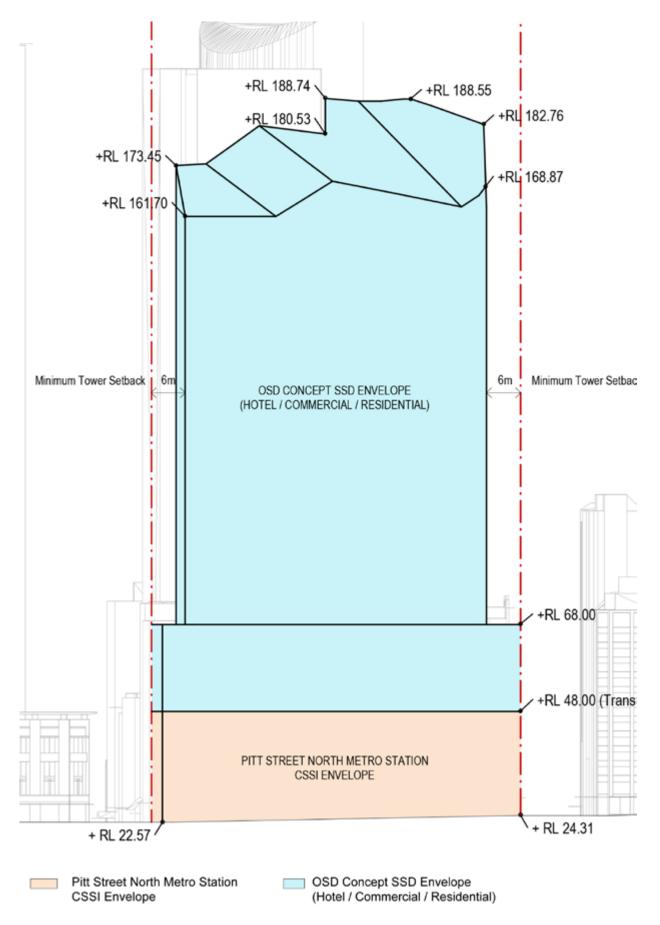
Southern elevation of proposed building envelope, demonstrating Station Envelope (Orange) and OSD (Blue)
